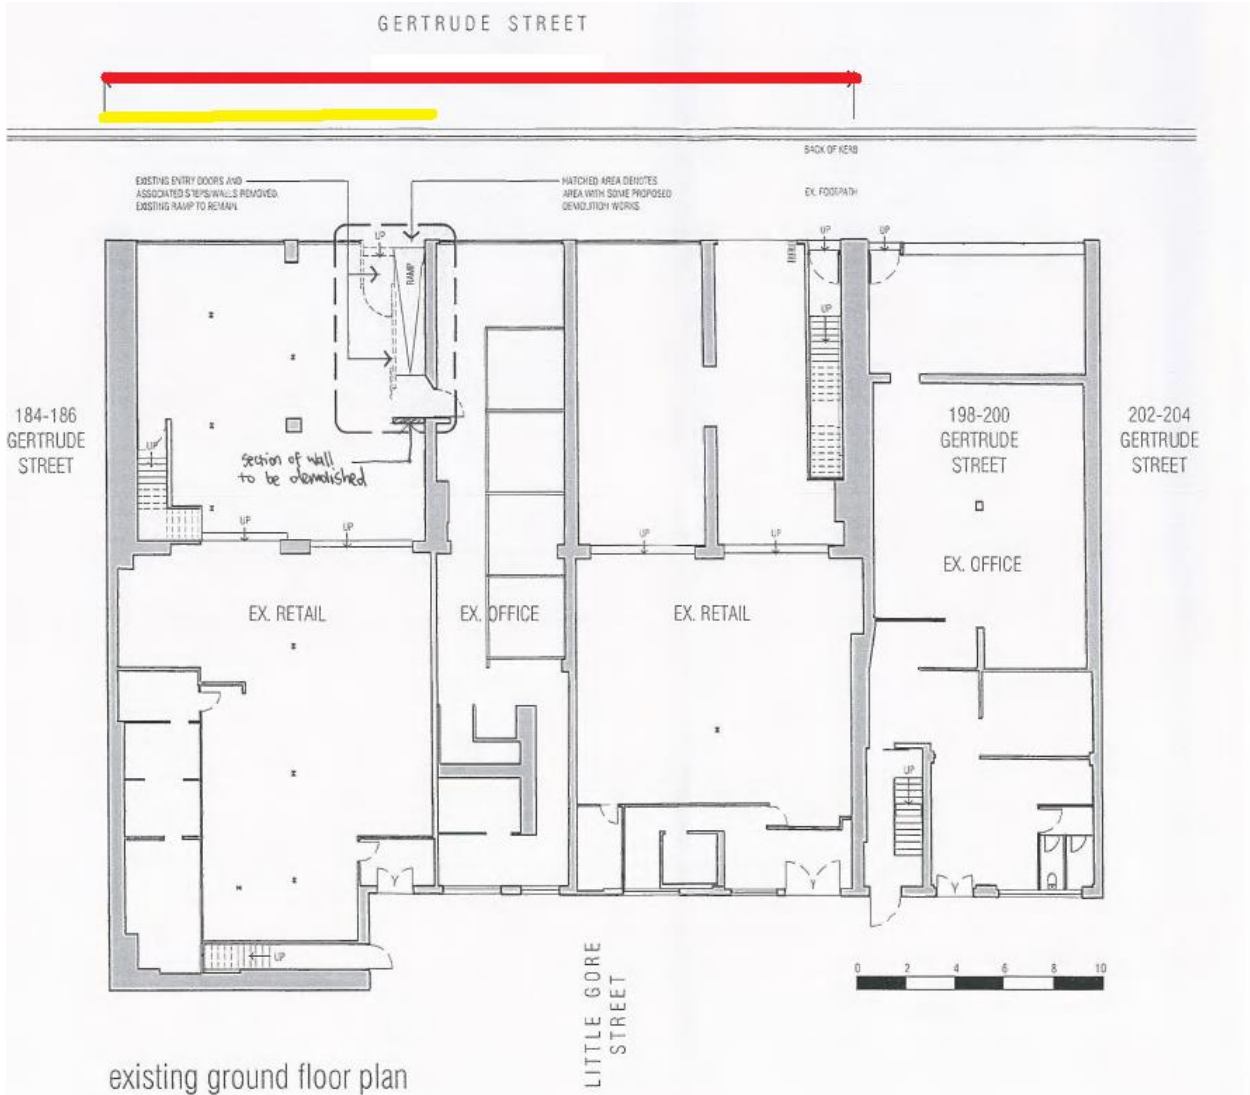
The extent of the subject building (red line) and subject site (yellow line) as they relate to the ground floor of the subject building.
